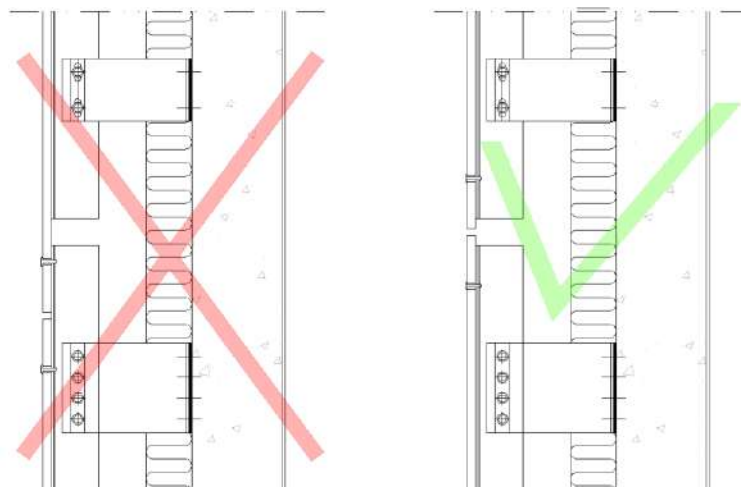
Vertical sections – Examples of incorrect and correct arrangement of cladding panels along an expansion joint between one subframe vertical profile and the next
